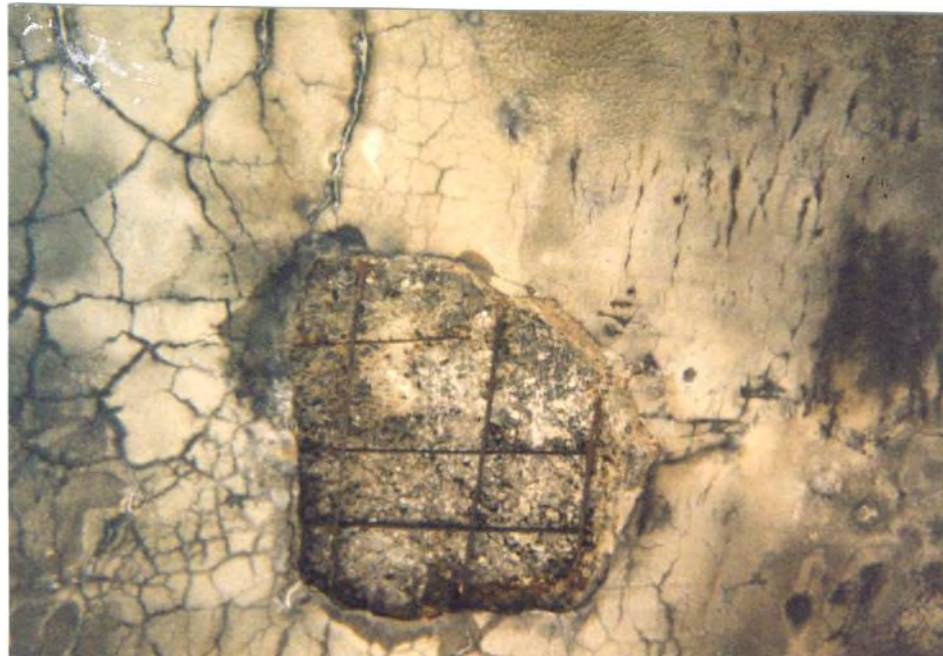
Looking up and west at underside of the west span arch ring. Note: Large spall with deteriorated reinforcing bars and medium to wide cracks in the surrounding concrete. Photo taken prior to repairs in 2000.
